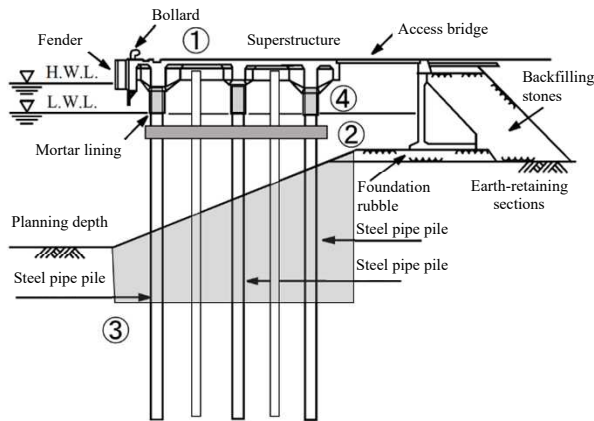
Stability improvement mechanism for pile piers (when applying an improvement method that uses an existing structure)
